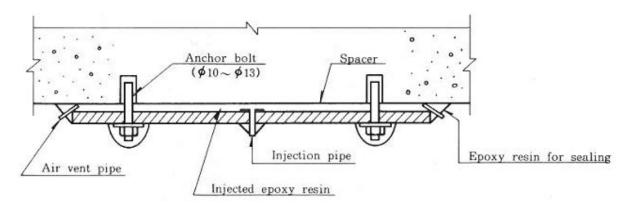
Example of the epoxy bonded steel plate method
